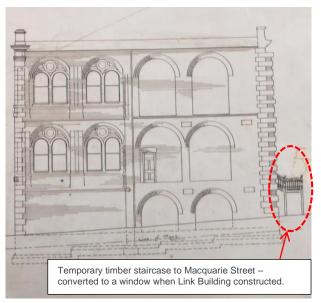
Southern (side) boundary of Strong Room (to be adjoining Link Building after Link Building constructed)
